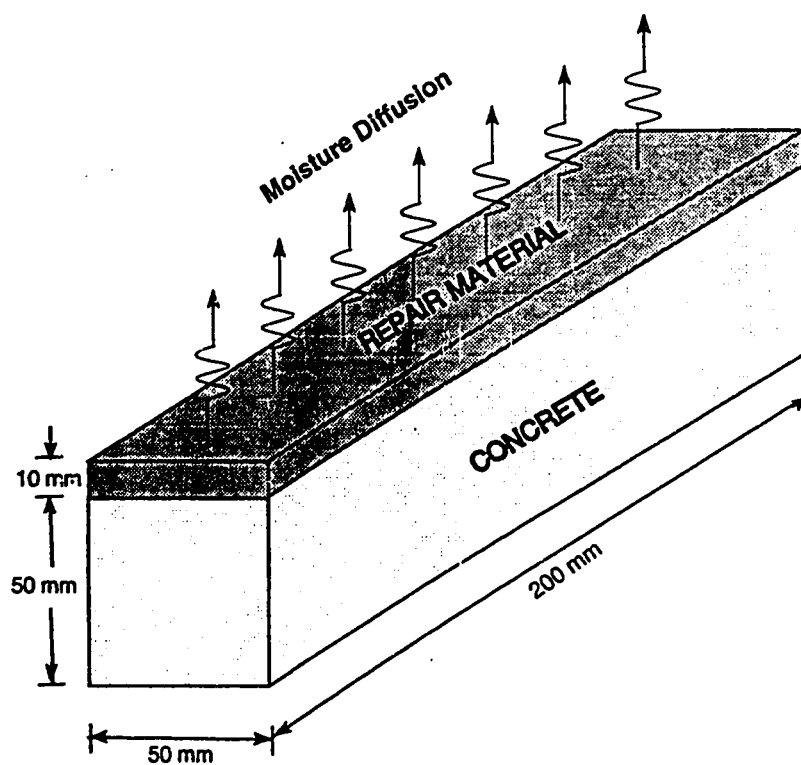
Specimen with a Repair Layer Over Concrete Substrate
